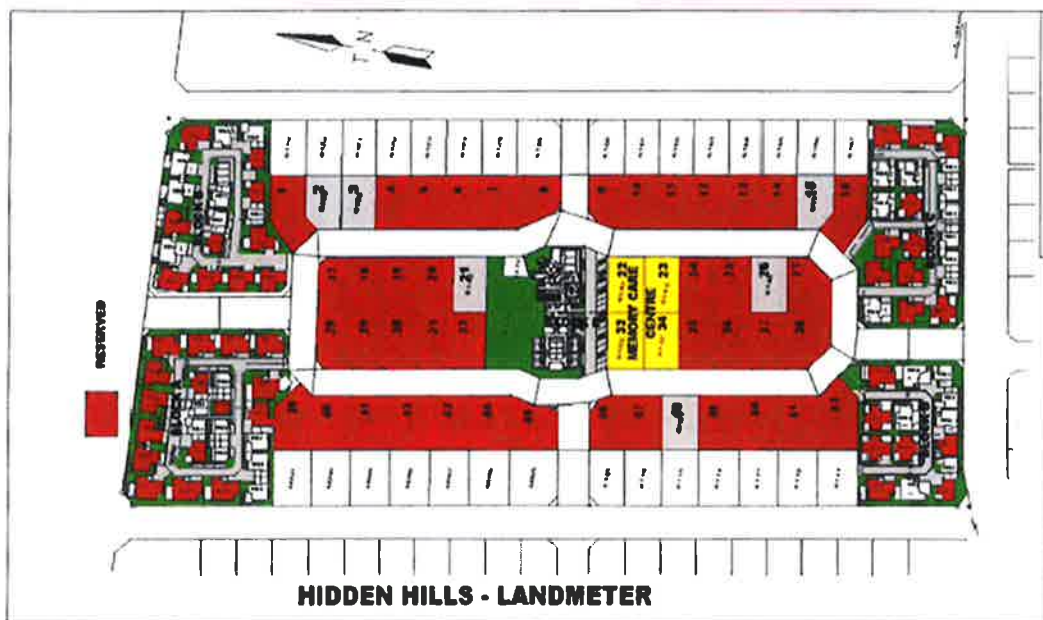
Overall site plan for the Hidden Hills Retirement Village.
